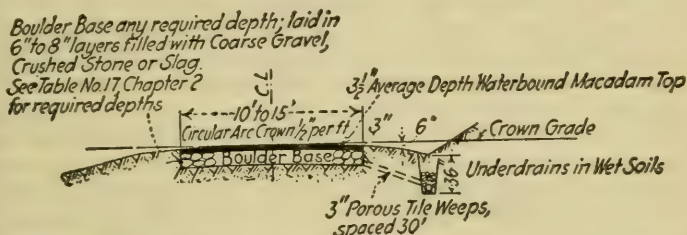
B.—Recommended waterbound macadam pavement section boulder base construction Class III or IV traffic.
